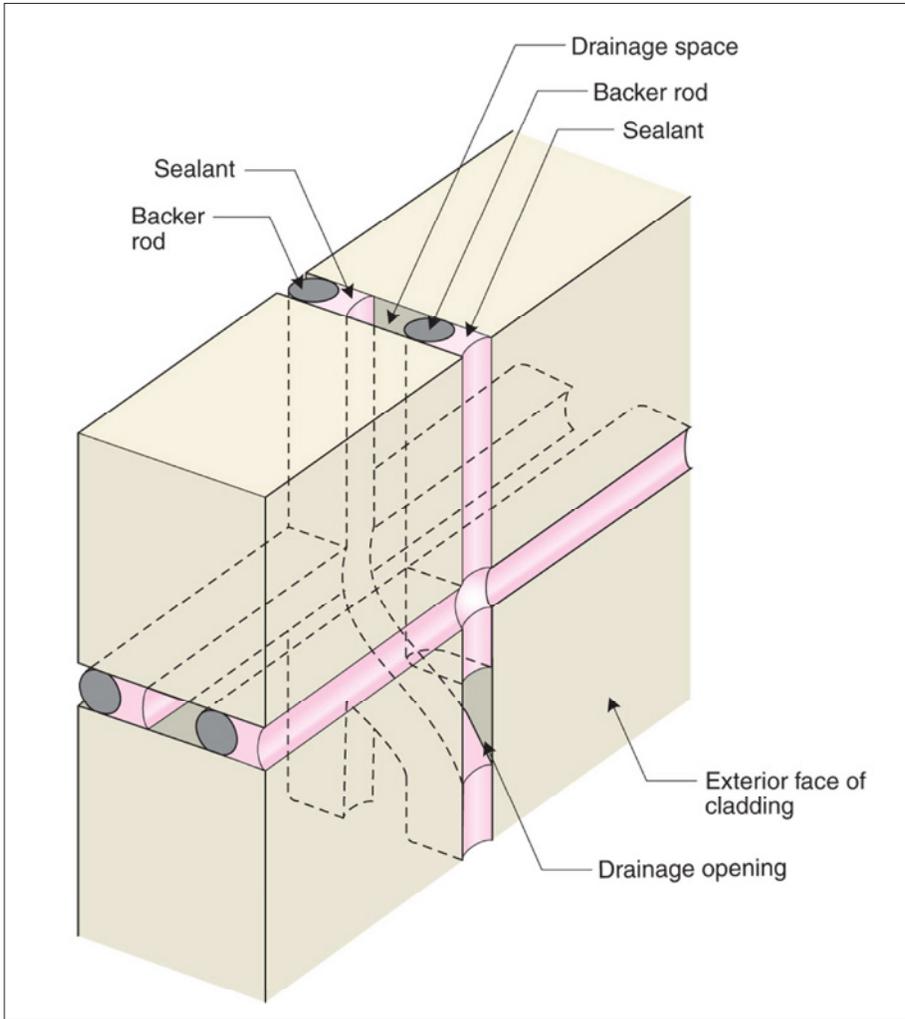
Details of a two-stage joint at a drainage/vent hole. Image copyright RDH Building Science Inc., used with permission
